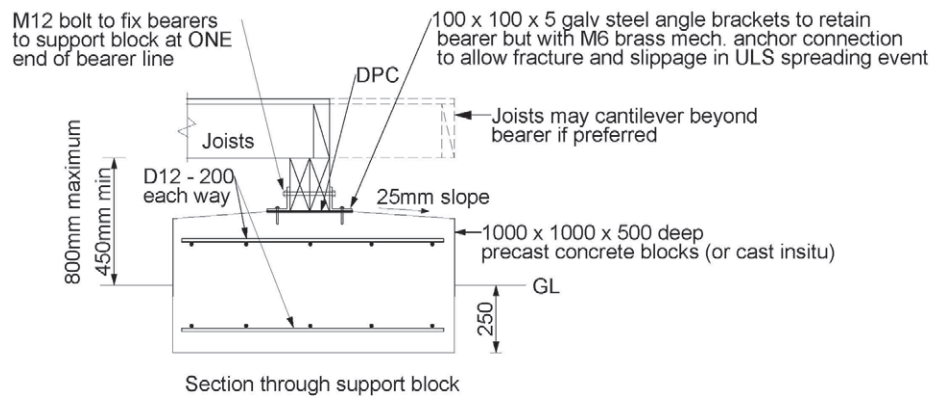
Type 3A surface structure - Detail at supporting blocks
